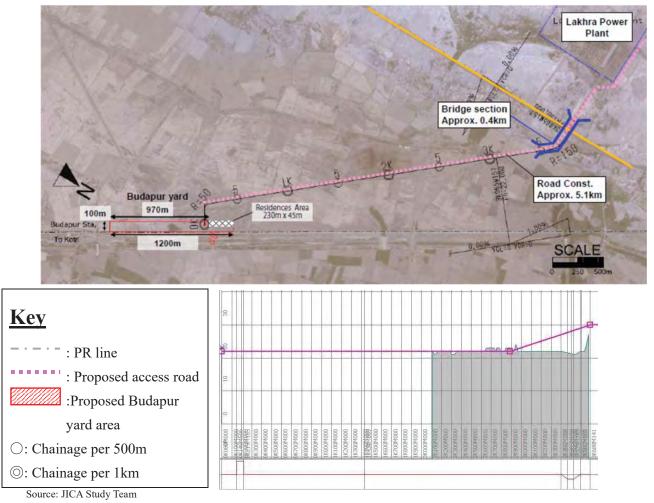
Proposed Access Road Plan and Profile between Budapur Station and Lakhra Power Plant
